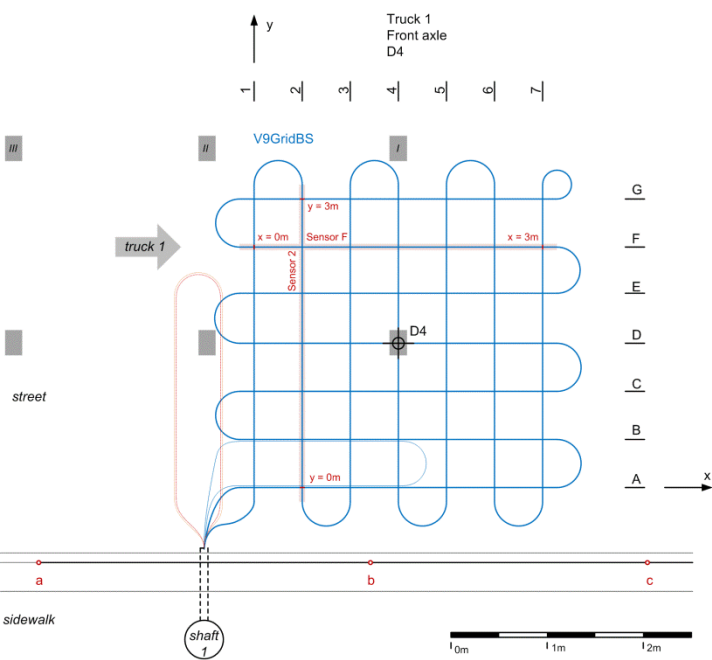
Footprint of truck 1 in tests using the front axle with sensor V9GridBS
